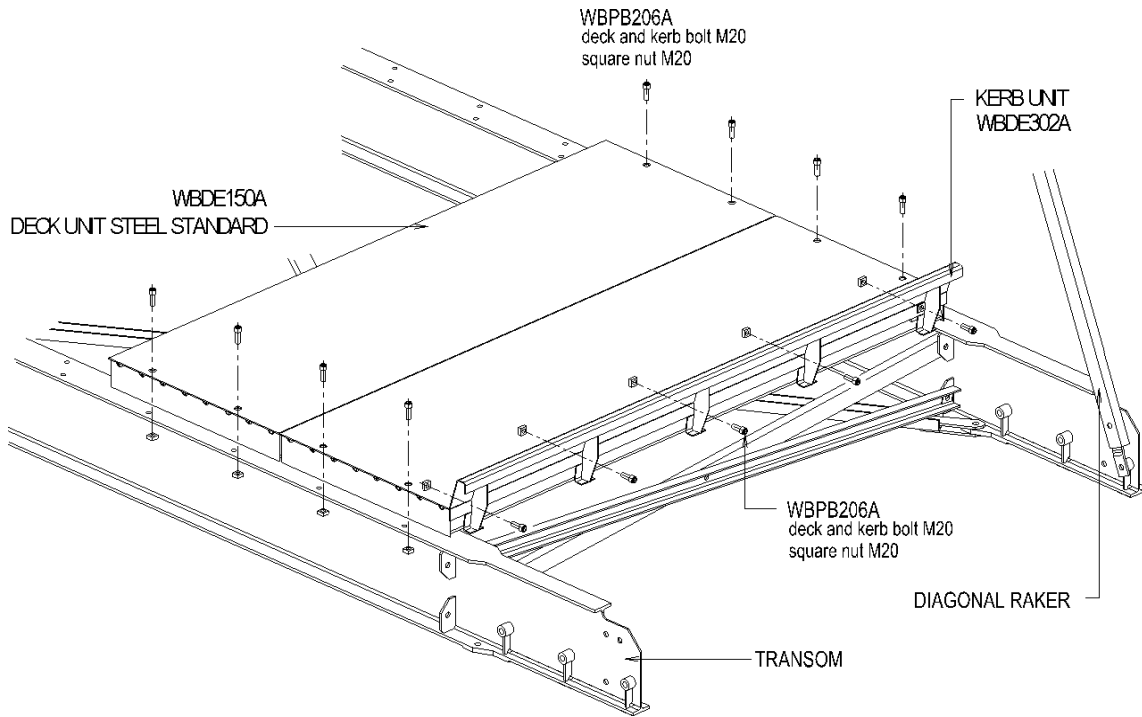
CONNECTION OF THE DECK AND KERB UNIT
